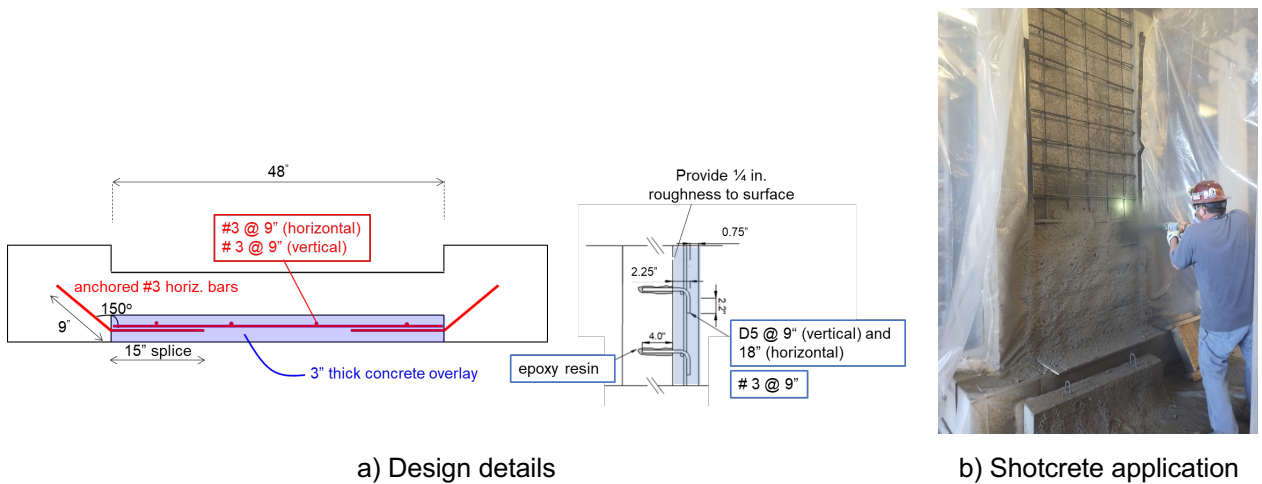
Details and construction of Specimen 2 shotcrete overlay
